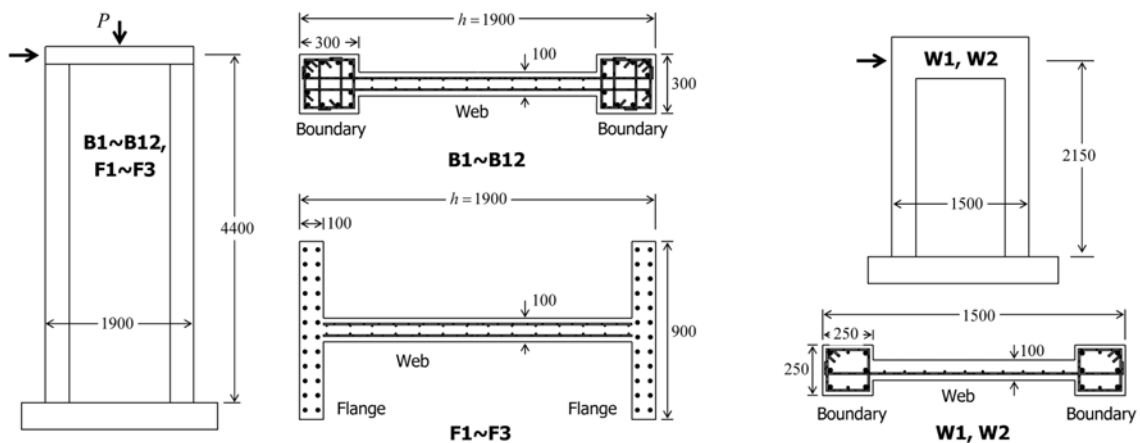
Configurations and section properties of existing wall specimens (mm)
